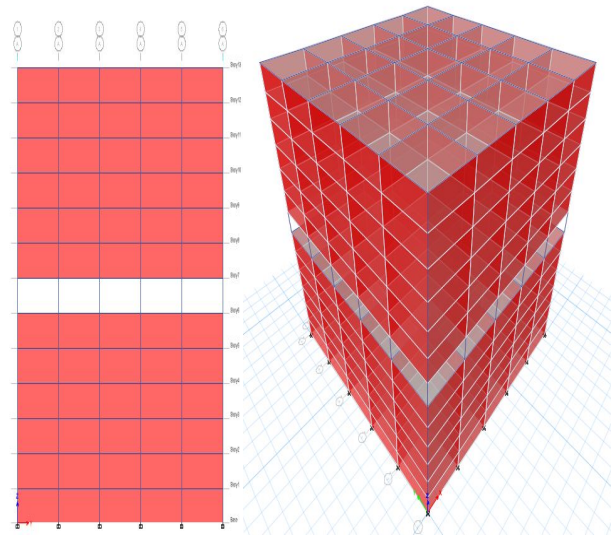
Model No. 2: Multistorey building with Soft storey floor at seventh floor.
